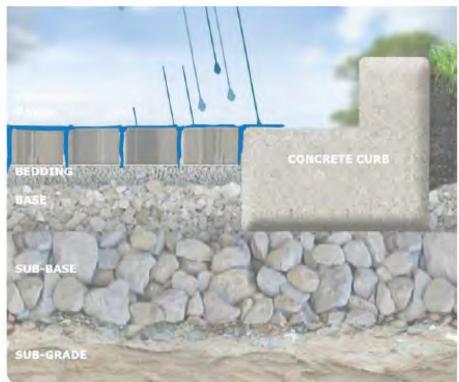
Example of a Permeable Paver Parking Lot Cross-Section (APT, 2011)
